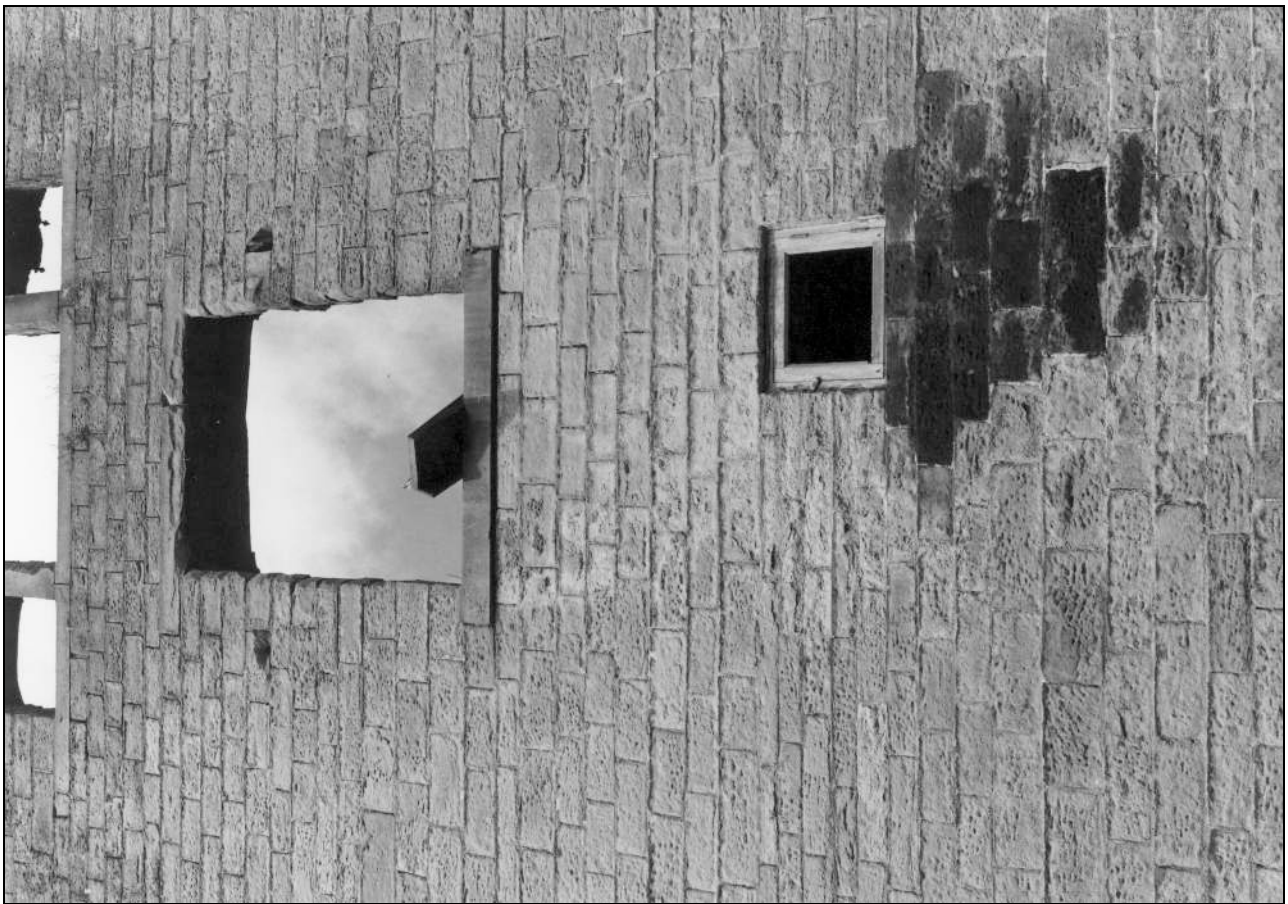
Spinning mill: east gable, showing shuttered opening and window with former transom (film 2, frame 9)
